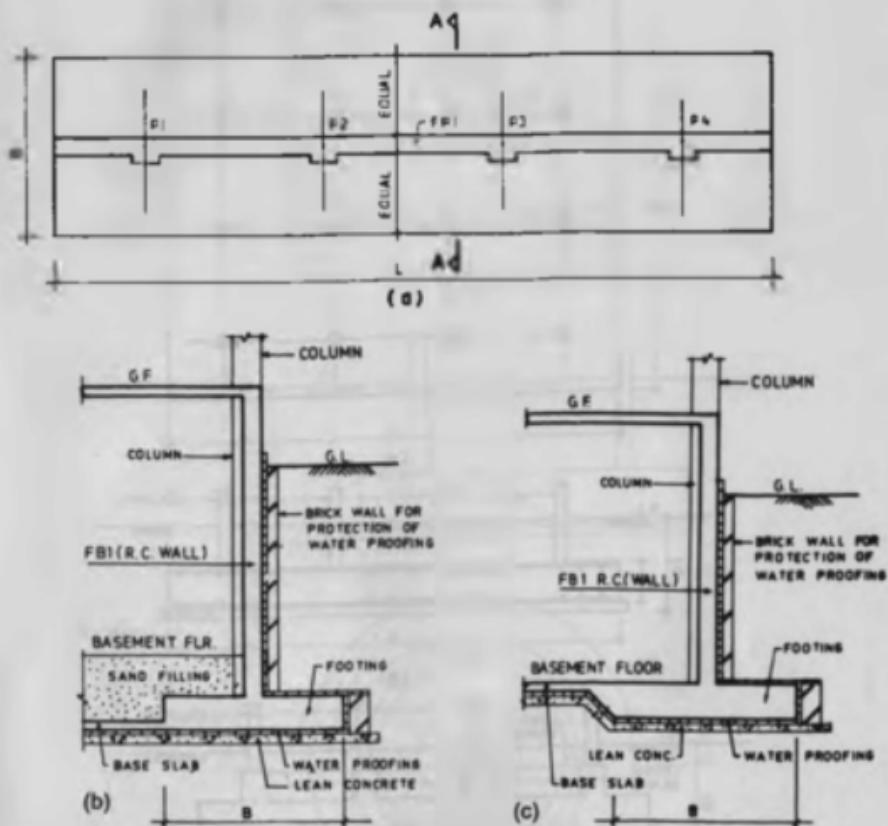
Strip footings with basement RC wall acting as central beam FB₁. (a) Plan of strip footing; (b) Section A-A (Alternative II); (c) Section A-A (alternative I).
